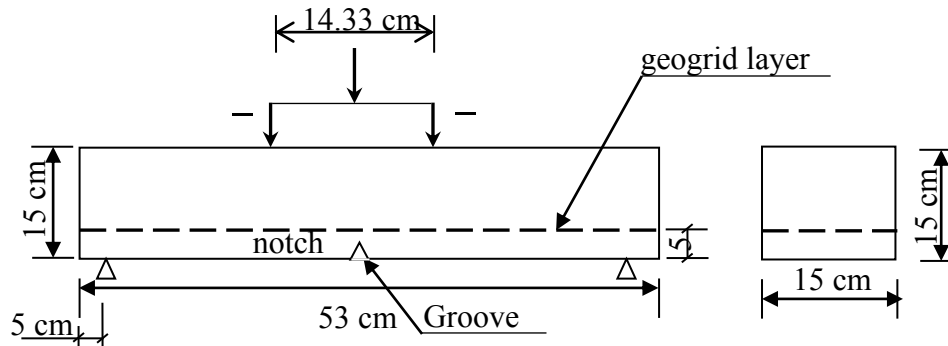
Typical longitudinal section showing loading position and reinforcement layout
